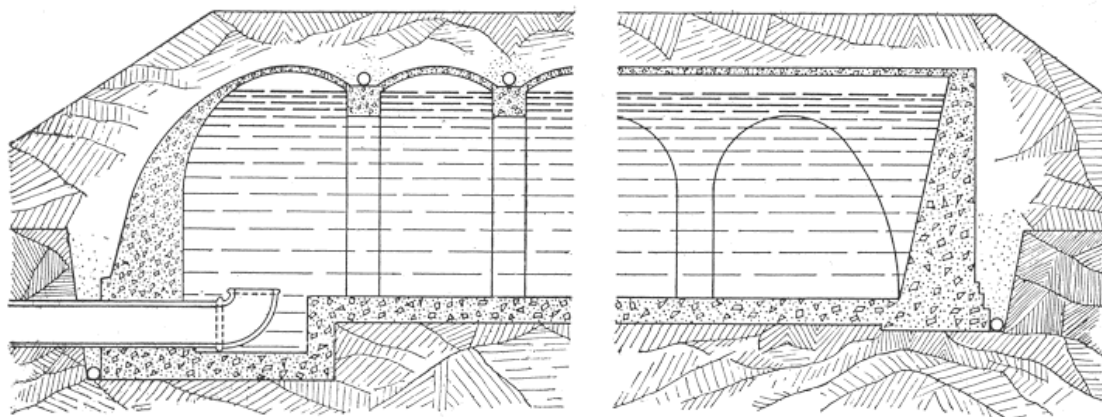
COVERED UNDERGROUND RESERVOIR OF CONCRETE MASONRY.
